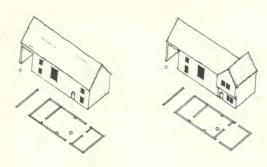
Sun House, Potton: development of plan from hall-house to hall-and-crosswing house.
